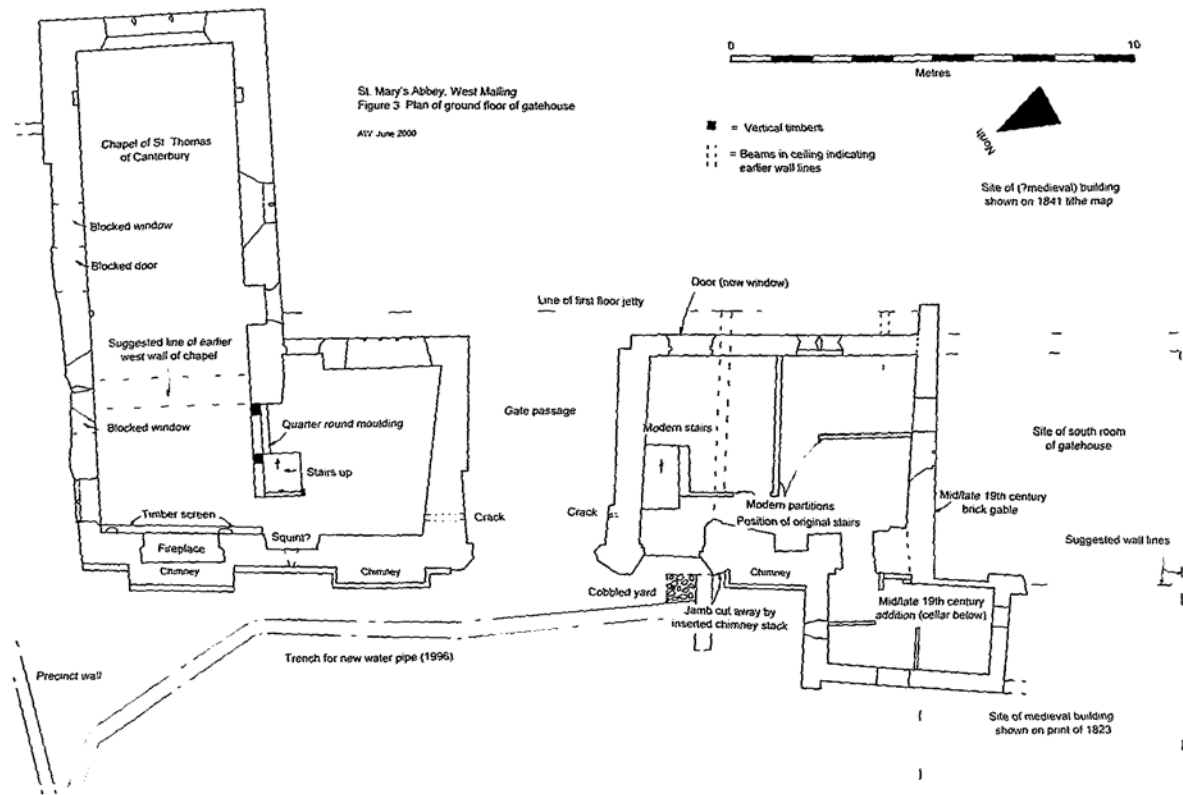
St Mary's Abbey Gatehouse: plan of ground floor.
